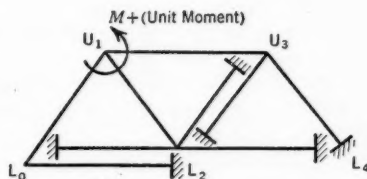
MEMBER GROUP, AIRPLANE TRUSS
